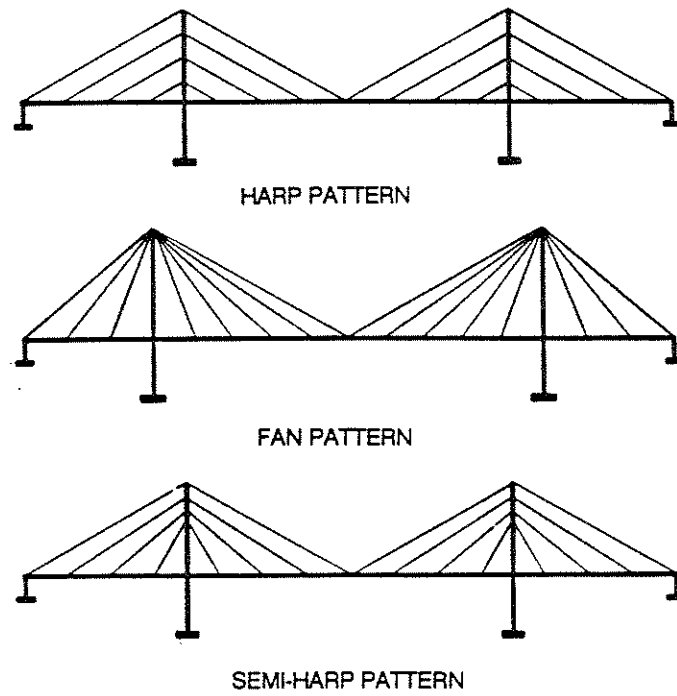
LONGITUDINAL CABLE ARRANGEMENTS.
